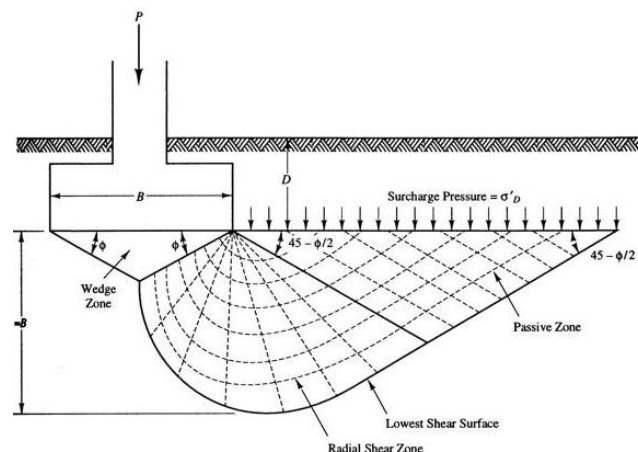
General Shear Failure beneath a Shallow Foundation
